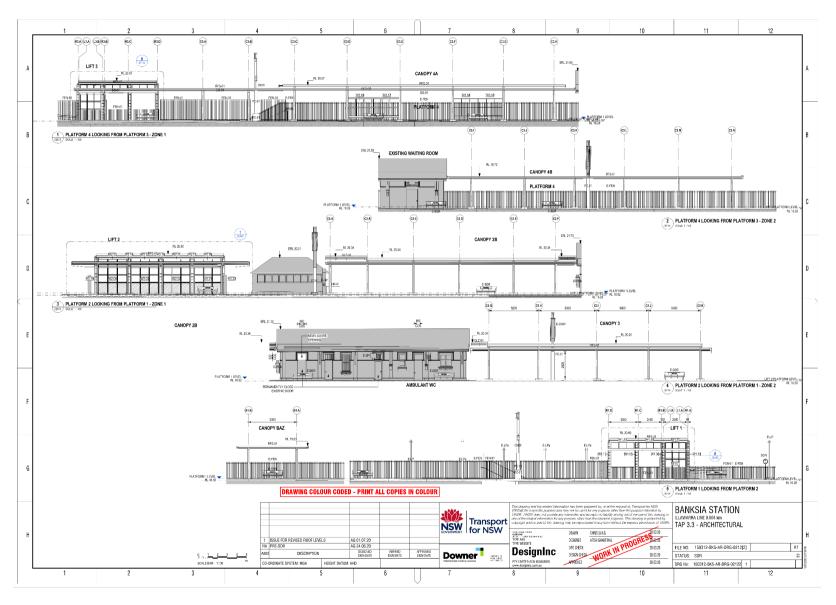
Banksia Station architectural elevations – Sheet 3
